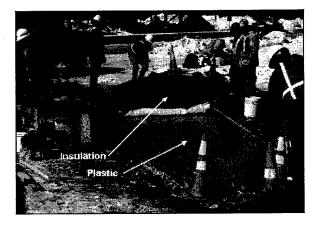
Sidewalk covered with a sheet of plastic and a layer of insulation.
